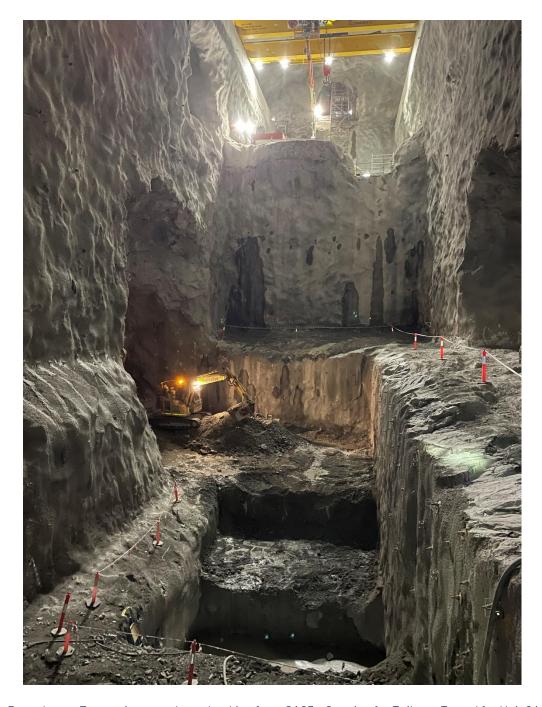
Powerhouse Excavation complete – Looking from CAO3 – Opening for Tailrace Tunnel for Unit 2 indicated
